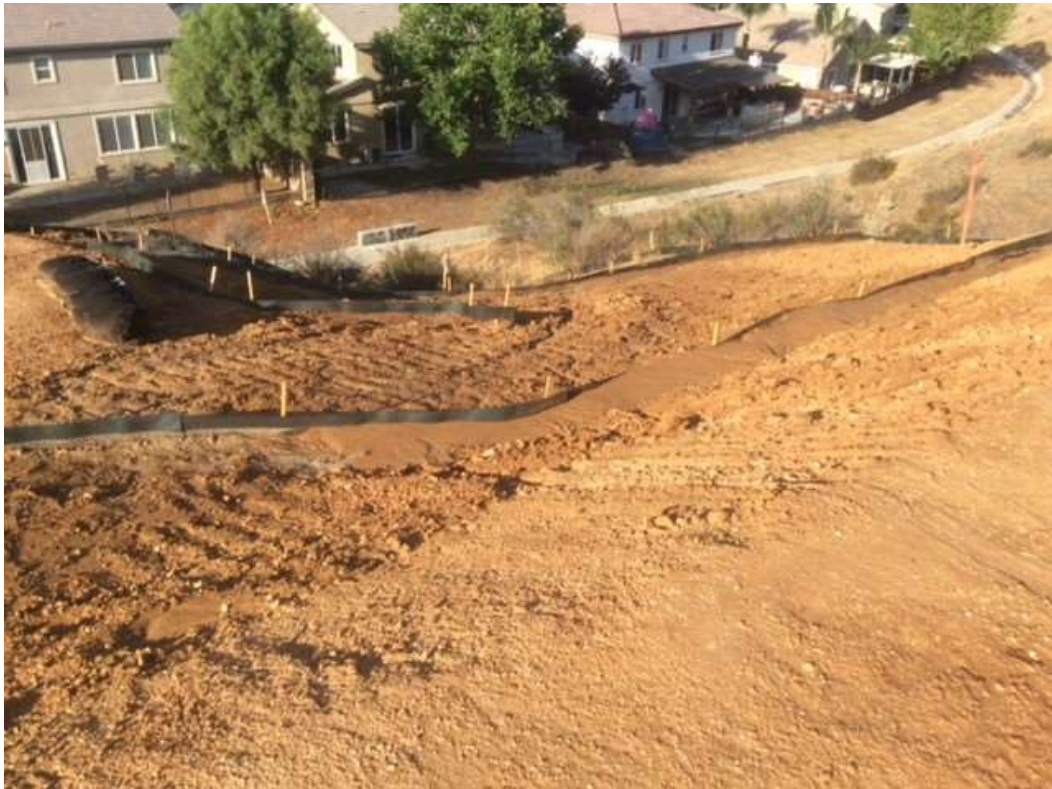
Sediment built up behind BMPs at Site 4X53. BMPs were maintained the same day (photo courtesy of SCE) (August 17, 2018).
